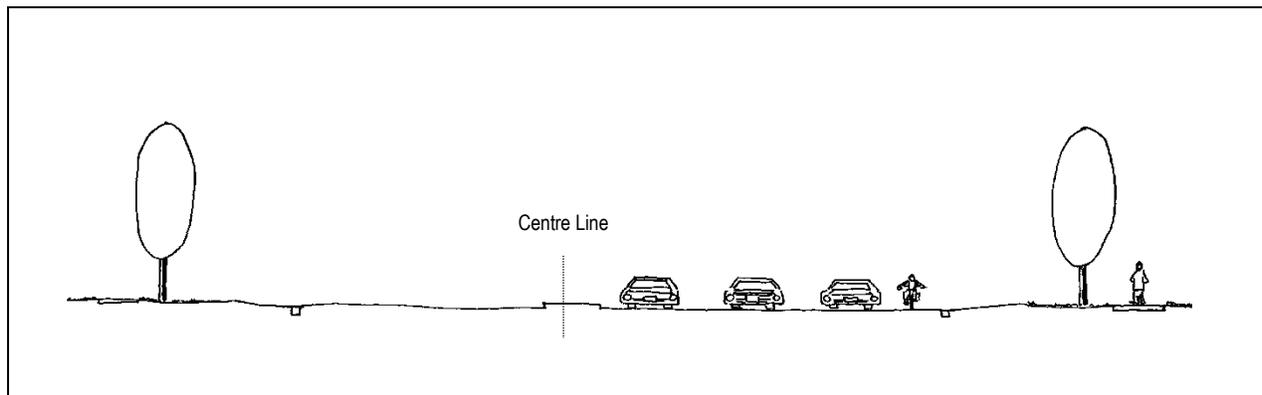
Figure A: Proposed Brock Road Cross-Section (36 m ROW min.)
